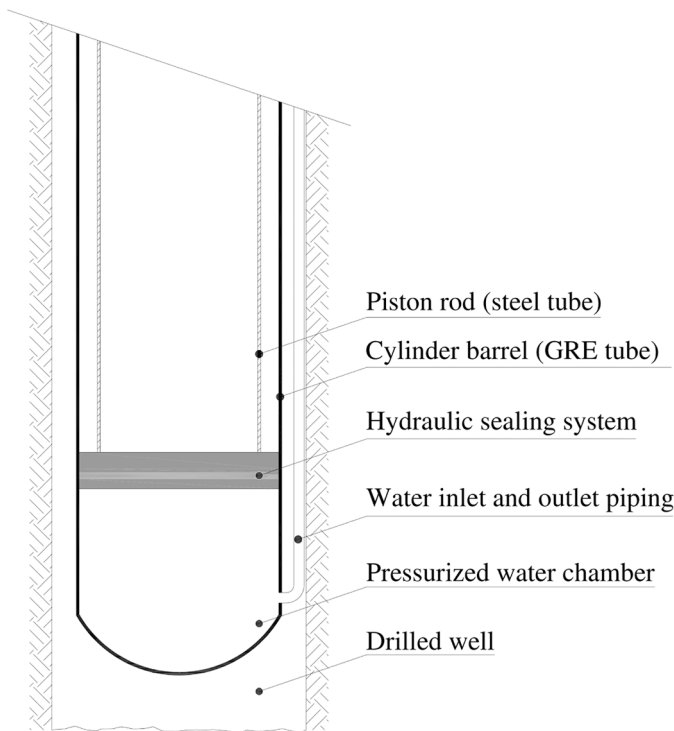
Well and barrel schematic section of the in-site hydraulic lifting system.
